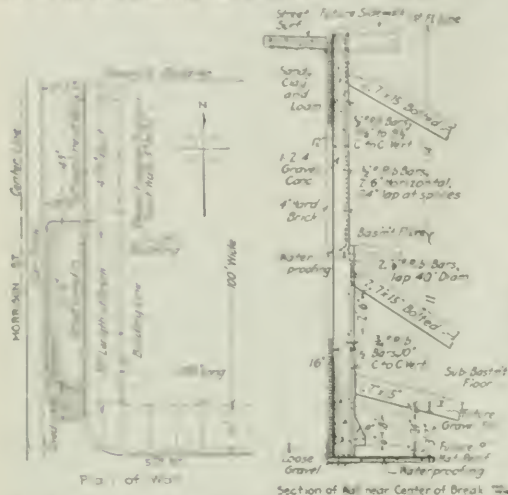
PLAN AND SECTION OF RETAINING WALL WHICH FAILED AT PORTLAND, ORE.
